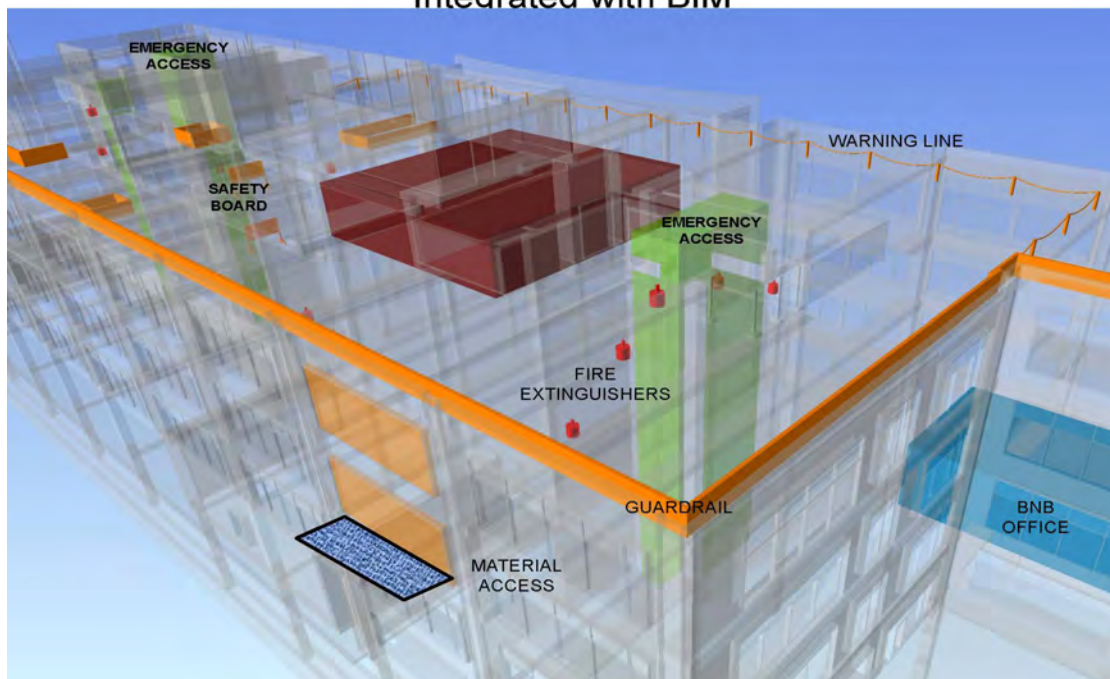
Site Safety Plan Integrated with BIM (Photo courtesy of BNBuilders)
